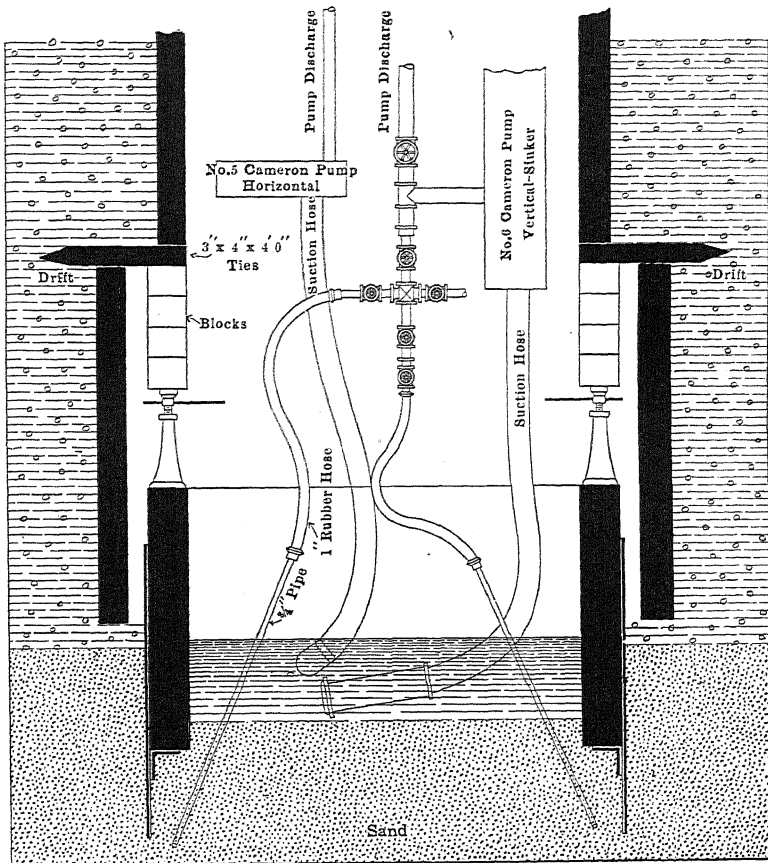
DETAILED SKETCH OF SINKING SHOE, JACK SCREWS AND PUMPS.
